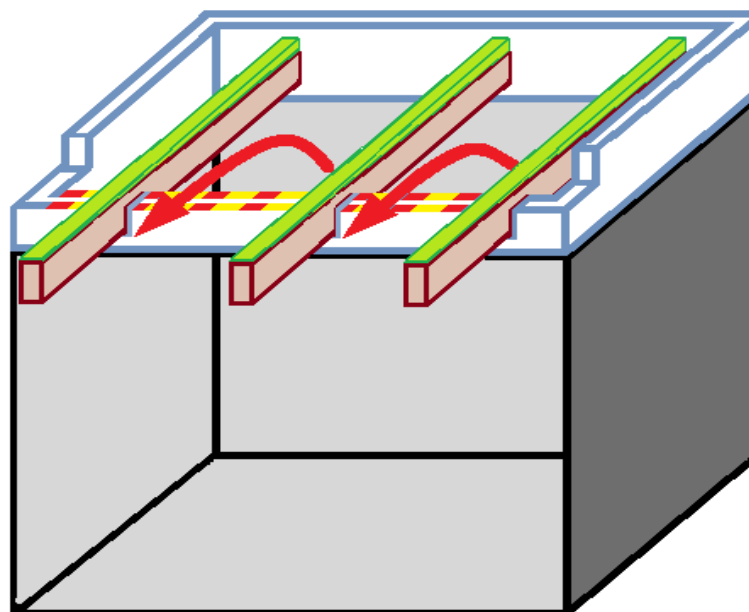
Simplified schematic drawing of the furnace and roof 'rig', with yellow/red chevrons indicating the line of fire stopping under consideration and the red arrows the anticipated route of fire spread
